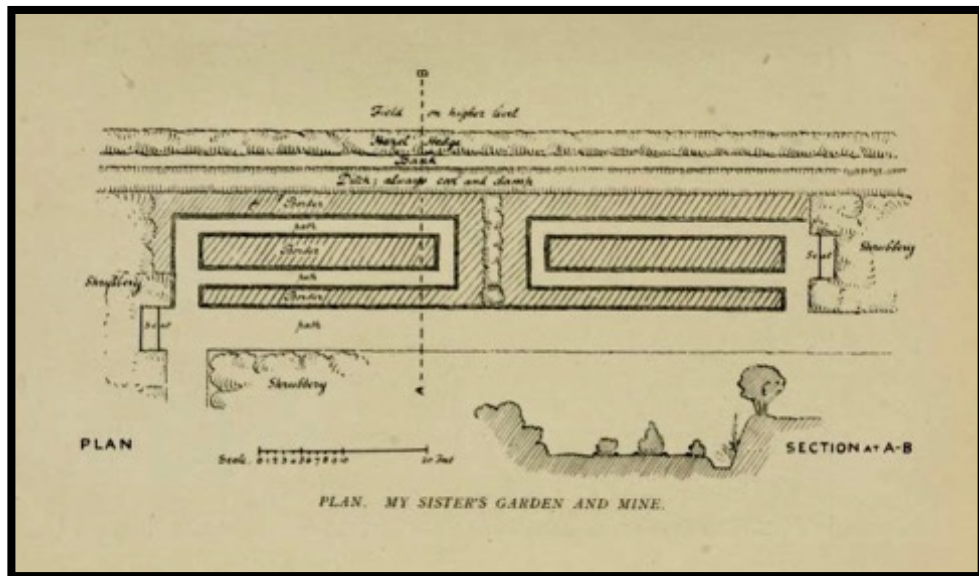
Gertrude Jekyll's First Garden at Bramley House (1908)
